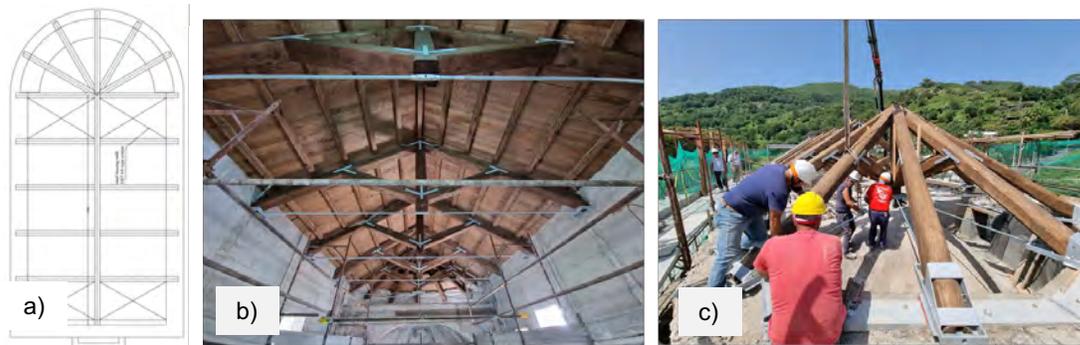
Timber roof structure. a) Roof scheme b) Central nave rood c) "umbrella-knot" (Source: Authors 2022)
